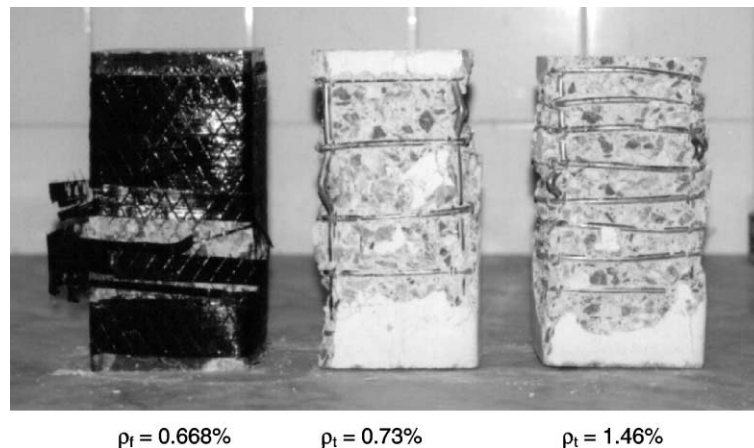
Mode of failure of concrete specimens reinforced with transverse steel reinforcement and FRP [13].
